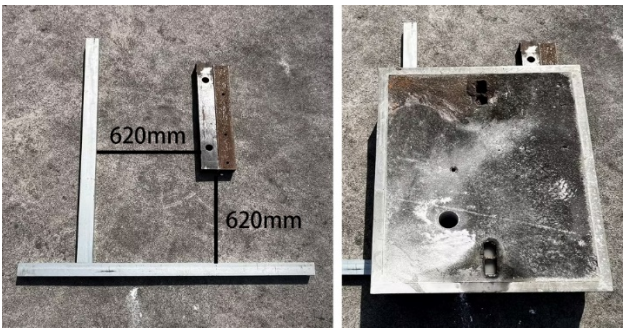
Layout diagram of field test of concrete cover plate after renovation.
